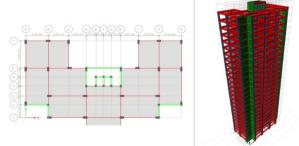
Dual system (Frame-shear wall) plan and structural Model
